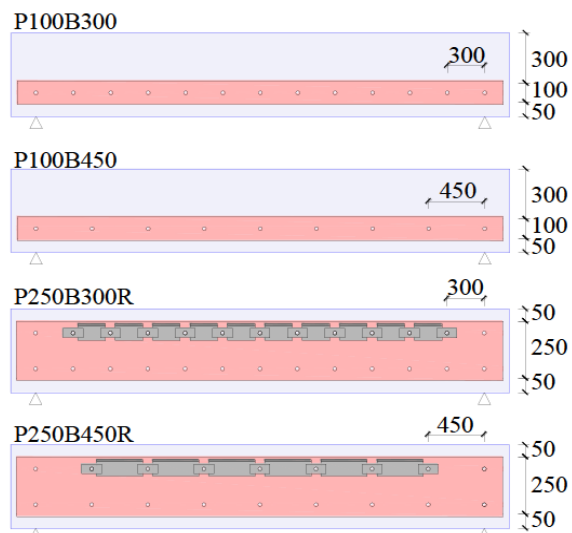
General view of the specimens strengthened with steel plates and bolted connections in study [27]
